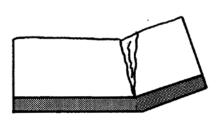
Separation of Headwall and Culvert Pipe
